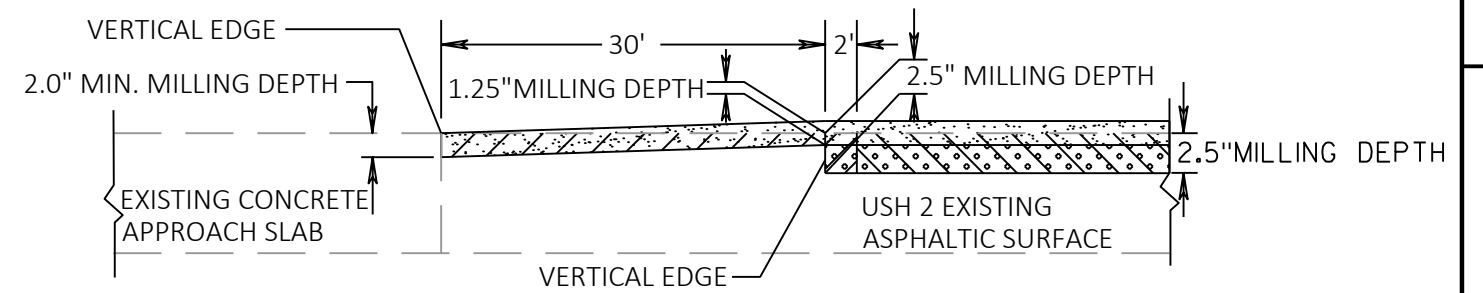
DETAIL FOR PAVED SIDE ROAD CONSTRUCTION JOINT
